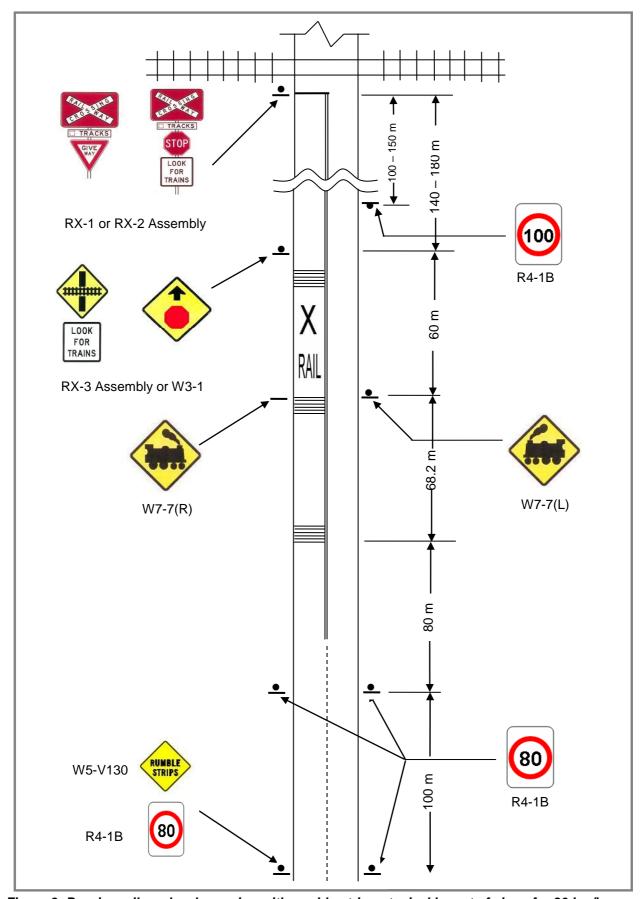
Passive railway level crossing with rumble strips - typical layout of signs for 80 km/h speed limit
